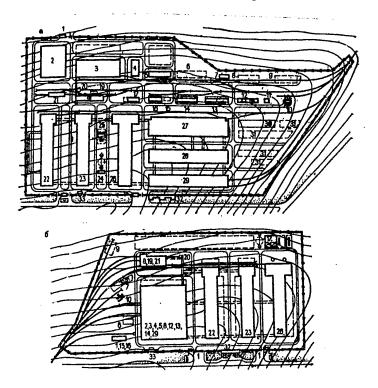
Master plan of a foundry. a--Before blocking; b--after blocking; l--passageway; 2--auxiliary shop building; 3--small-series casting building; 4, 5--pattern storages; 6--lumber storage; 7--acetylene station; 8--scrap distribution base; 9--compacting shop; 10--light petroleum products storage; 11--carbon dioxide storage; 12--building materials storage; 13--refractories storage; 14--main store; 15--binder storage; 16--oil and chemical storage; 17--compressor station; 18--sand storage; 19--clay storage; 20--coke and lime gallery; 21--coke storage; 22--gray cast iron shop; 23--forged cast iron shop; 24--water pumping station with tanks; 25--transformer substation; 26--steel casting shop; 27--nonferrous casting building; 28--nonferrous casting trimming facility; 29, 30--finished casting storage; 31--uncovered areas; 32--plant administration; 33--automatic scales.
